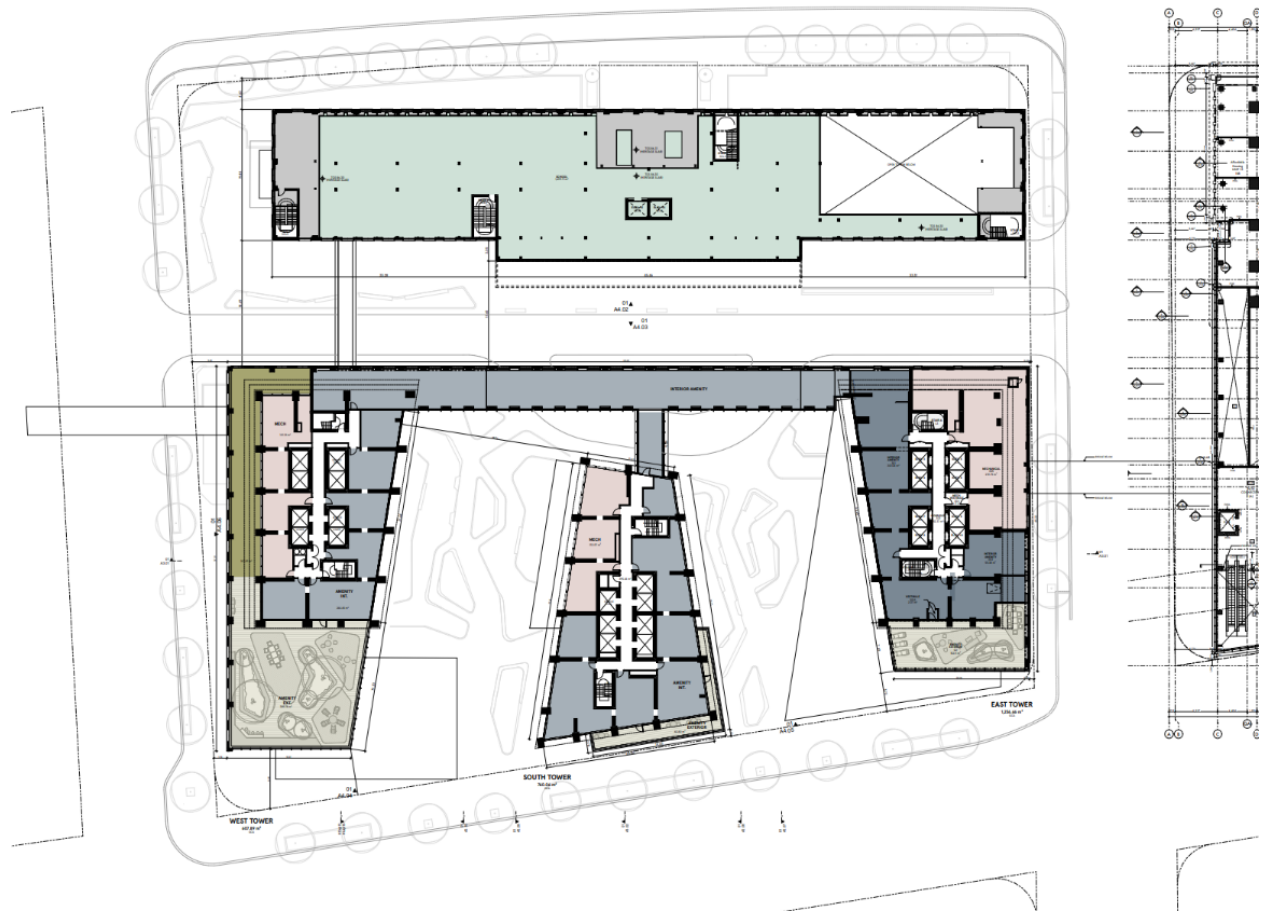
Level 3 floor plan for 55 Lake Shore Boulevard East included for illustration purposes (architectsAlliance, February 14, 2026).
